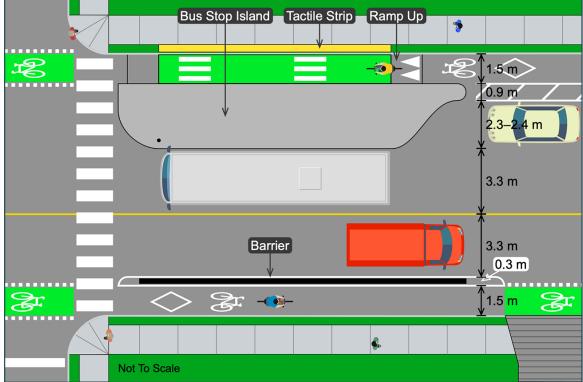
Front Street cycle track, typical cross-section, maximum right-of-way width
